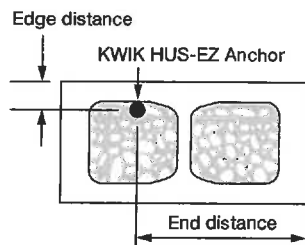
Edge and end distances for the KWIK HUS-EZ anchor installed in the top of CMU masonry wall construction
